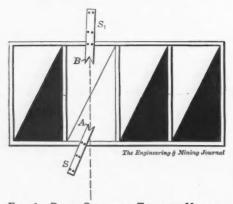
PLAN SHOWING TYPICAL METHOD OF PLUMBING
